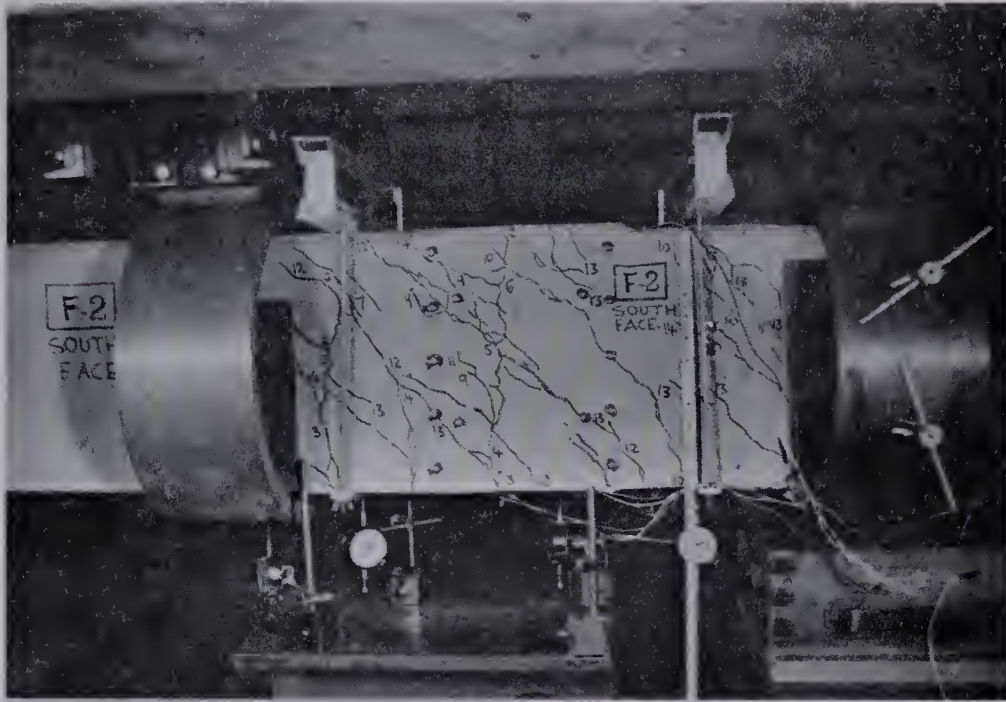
CRACK PATTERN FOR SOUTH FACE OF BEAM F-2
